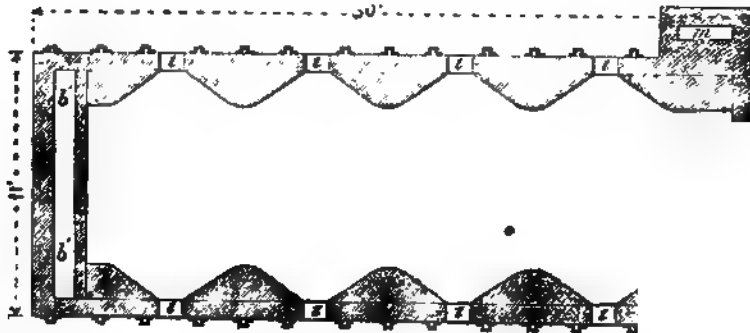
MUFFLE FURNACE, HORIZONTAL SECTION THROUGH WORKING DOORS.
